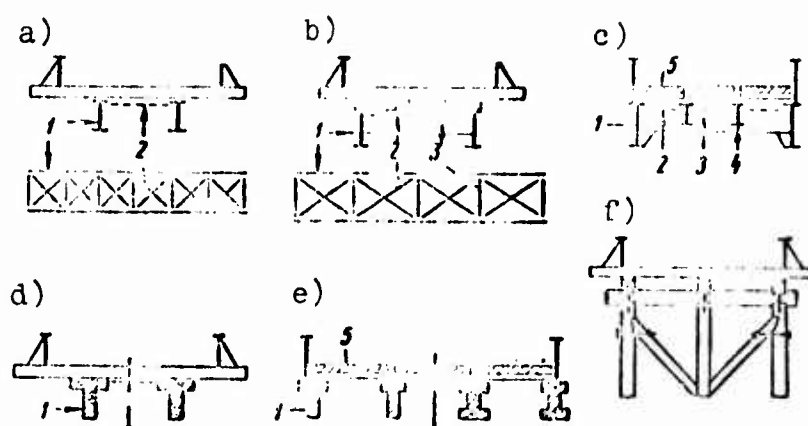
The diagrams of the span structures of haulage trestles: a) with two main steel beams and ties, lying directly on the beams; b) mixed with main and transverse beams and with longitudinal auxiliary beams; c) with metallic beam cages and sectional ferroconcrete slabs; d) with two ferroconcrete or prestressed beams; e) diagram of a ballast span structure with ferroconcrete and prestressed sectional beams and sectional slabs; f) diagram of a wooden trestle; 1 - main beam; 2 - connections; 3 - transverse beam; 4 - longitudinal beam; 5 - sectional slabs.
